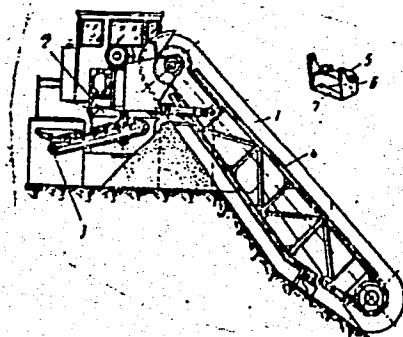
1 - Working member with numerous buckets, for transverse excavation; 2 - supporting-turning platform; 3 - carrier; 4 - frame of the working member; 5 - bucket; 6 - open body; 7 - blade.
